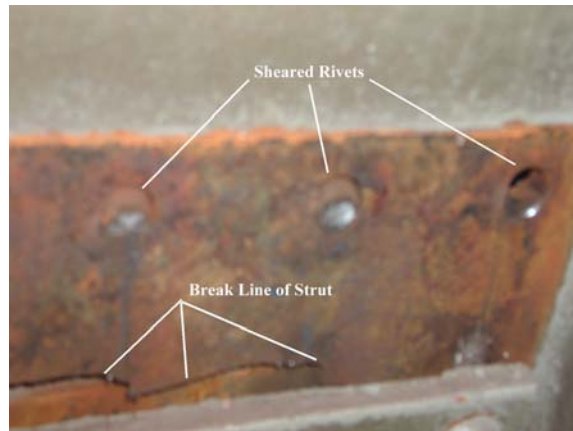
Shear Damage of Rivets and Fracture Surface
